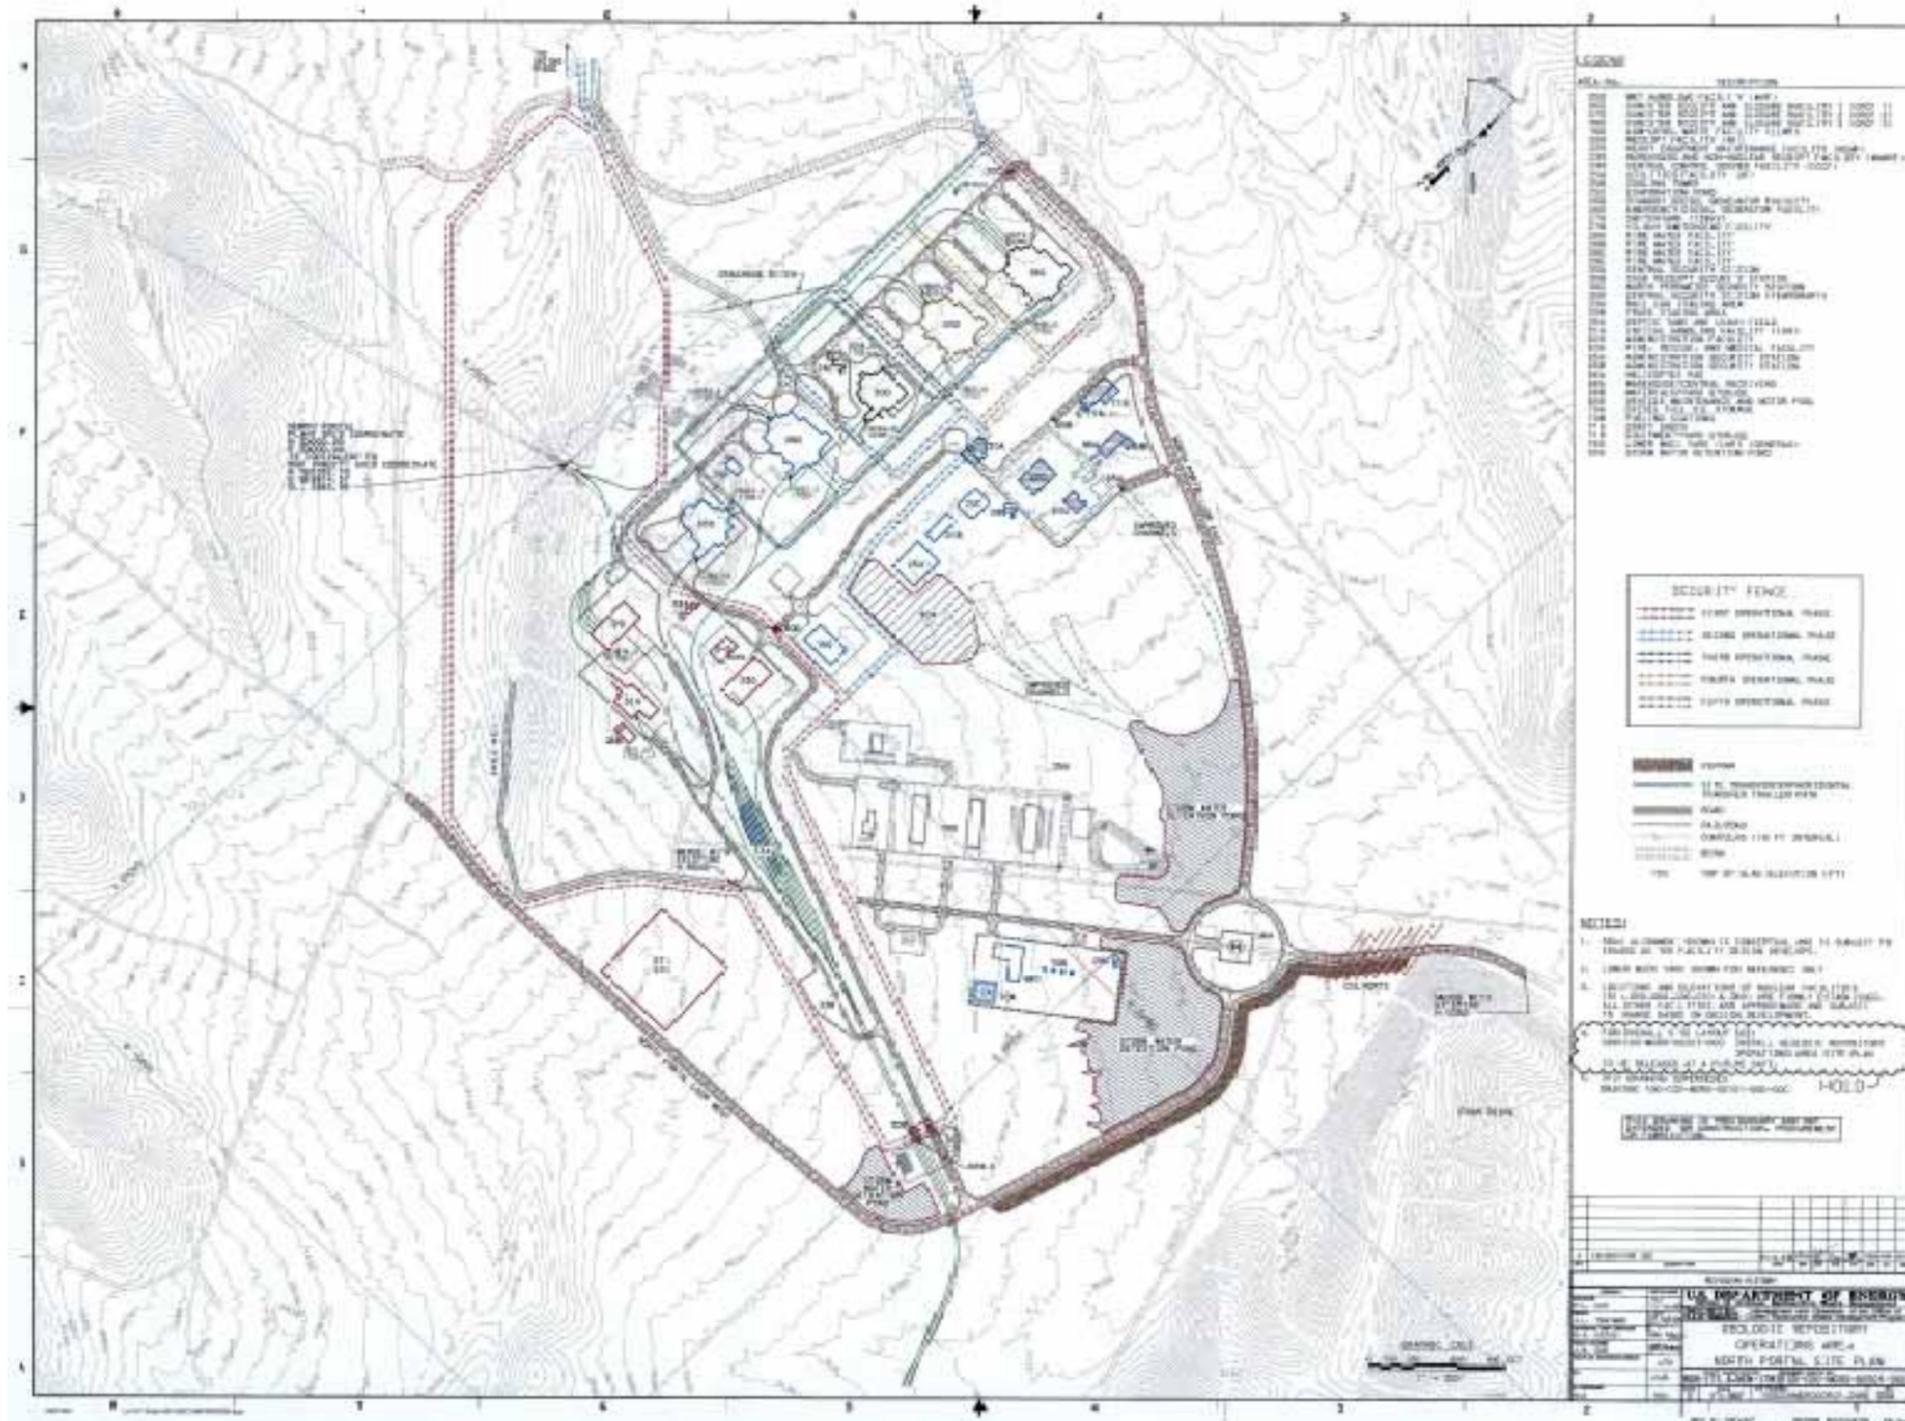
Building Layout Sketch. (Ref. Drawing: 100-C00-MGR0-00501-000-00A)
